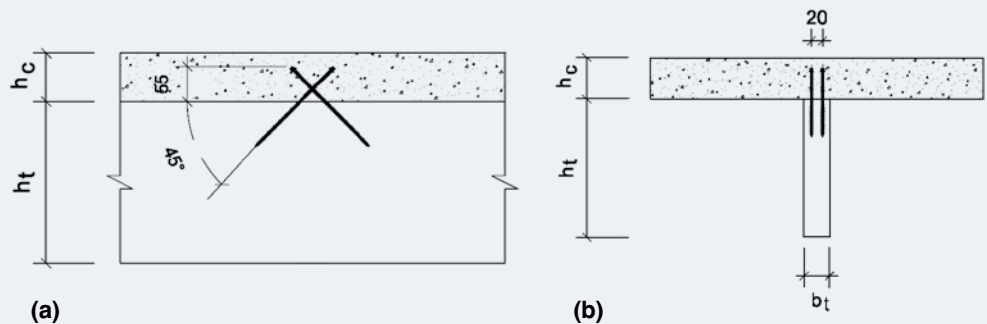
Cross SFS screw connection detail – profile (a) and cross-section (b).
